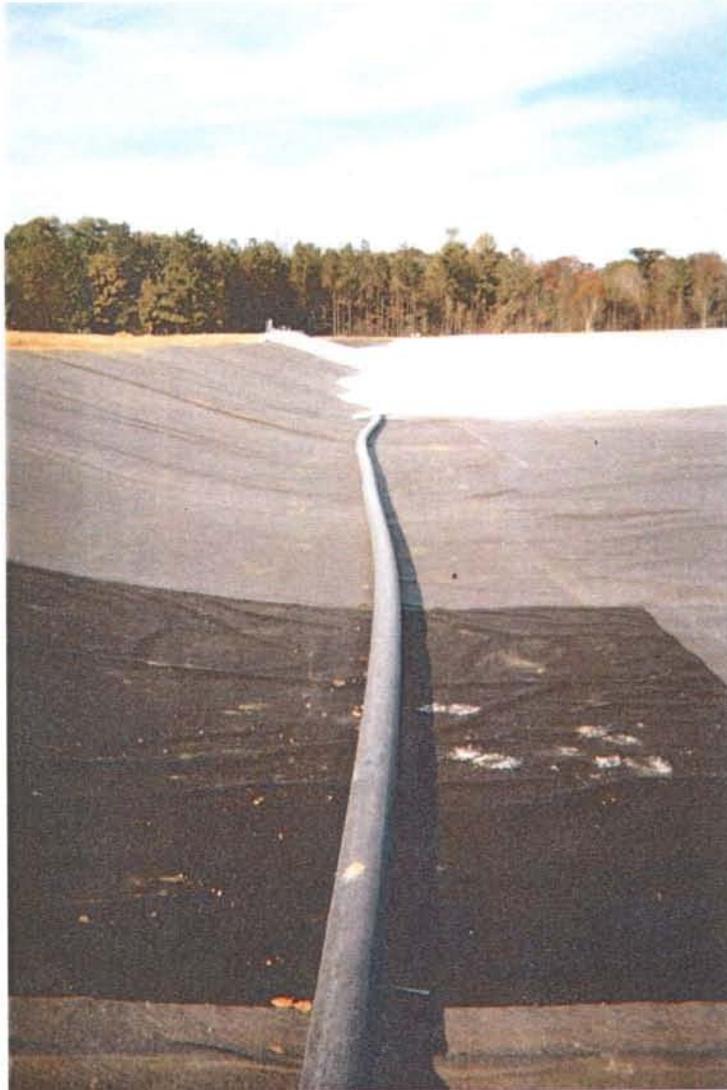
Leachate collection system manhole with 18-inch riser pipes from sump.
